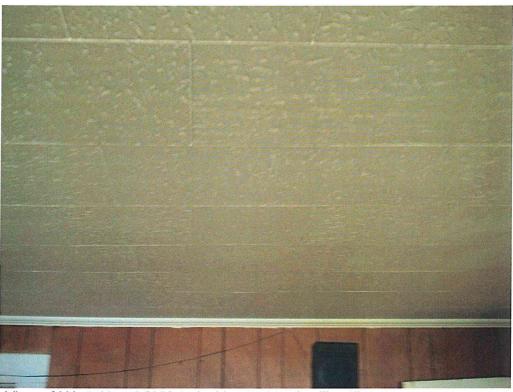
View of HA-5: Non-ACM interlocking textured ceiling tile.
